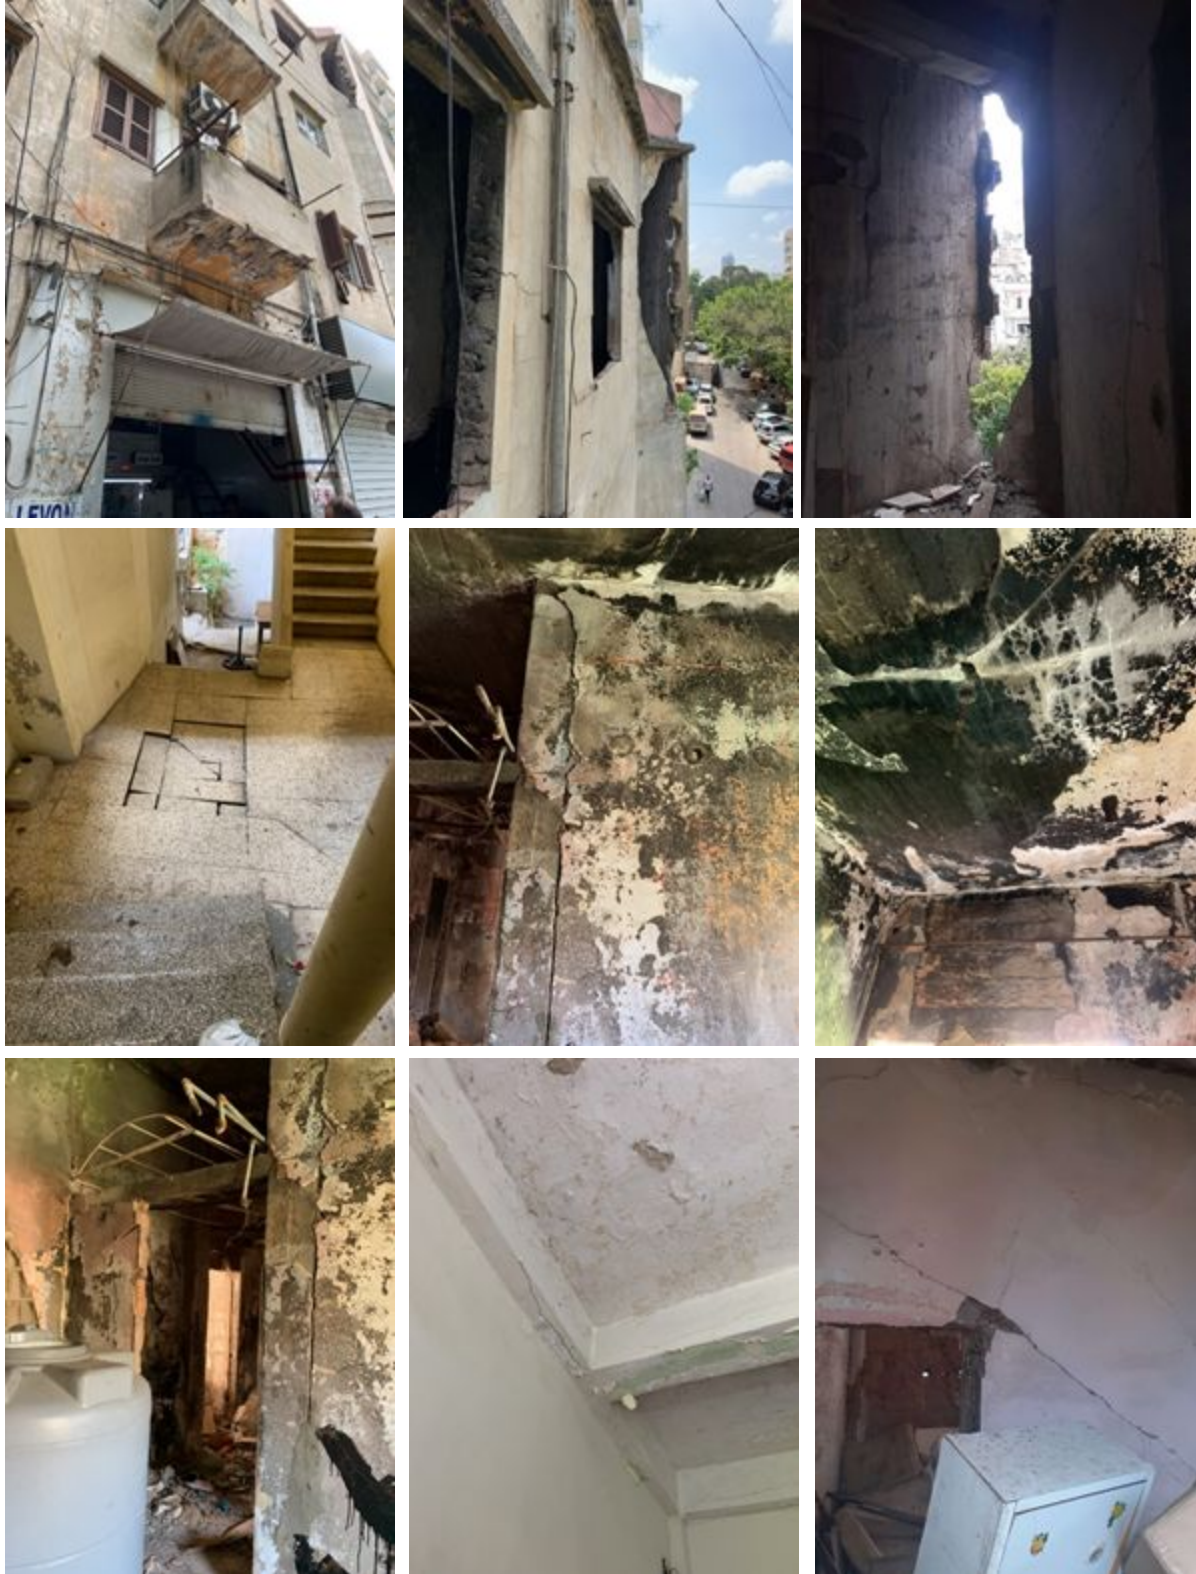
Heavily damaged (D3) older reinforced concrete building RC3 (33.8949° N, 35.5335° E) in poor condition before the blast.
